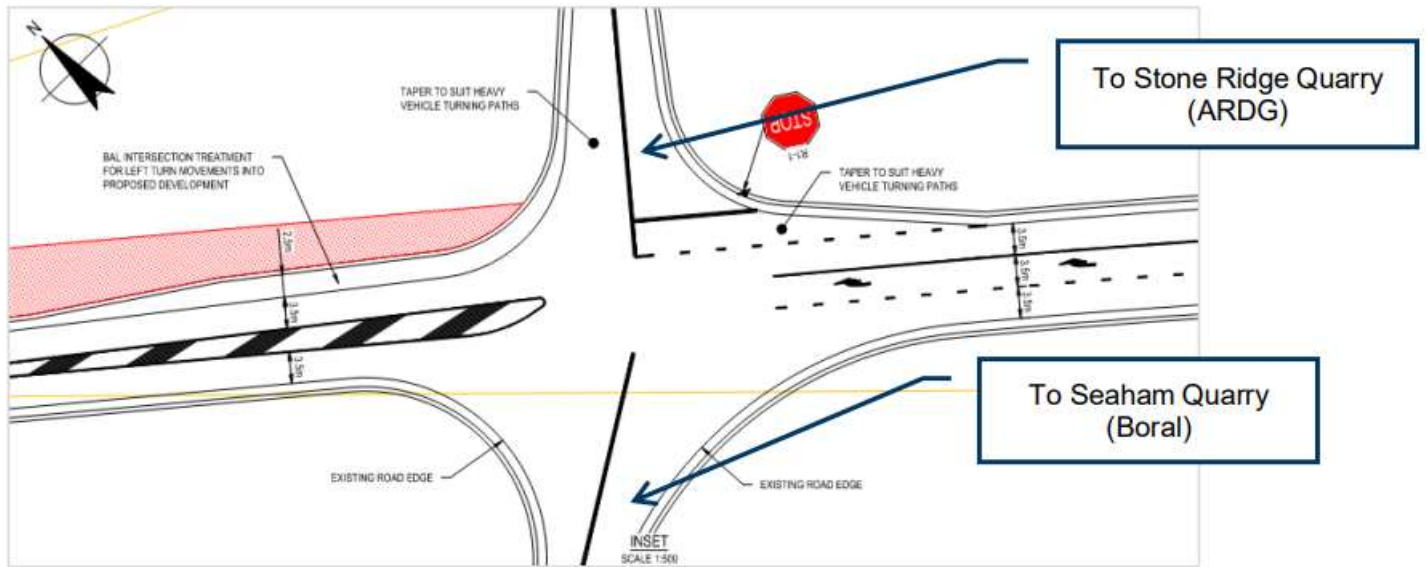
Italia Road / Site Access Road intersection upgrade
